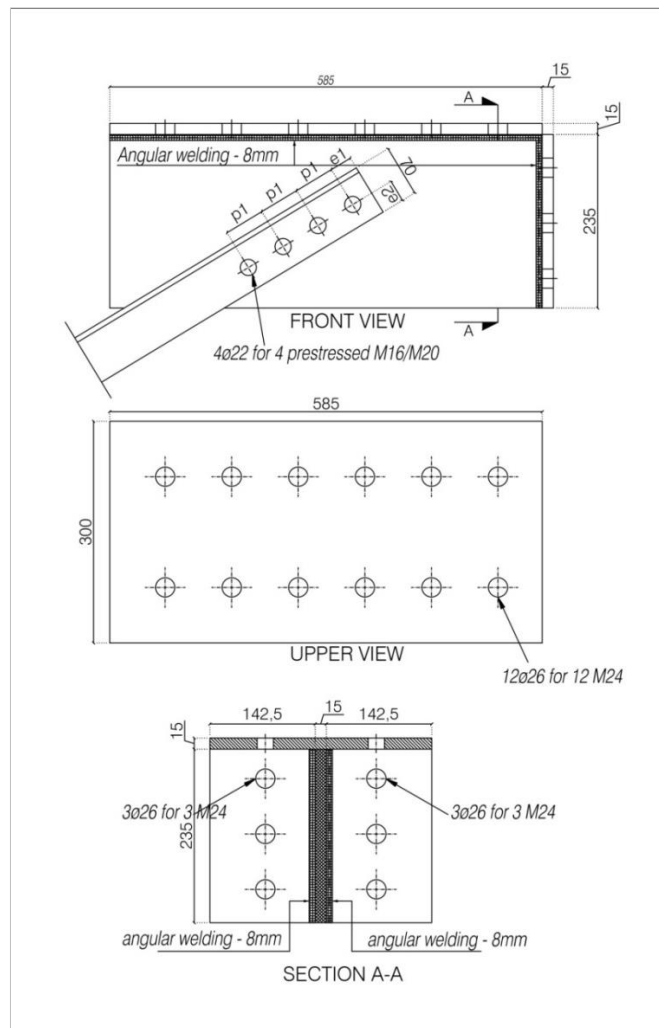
Construction details of corner connection modular systems in MRF (measures in mm)
